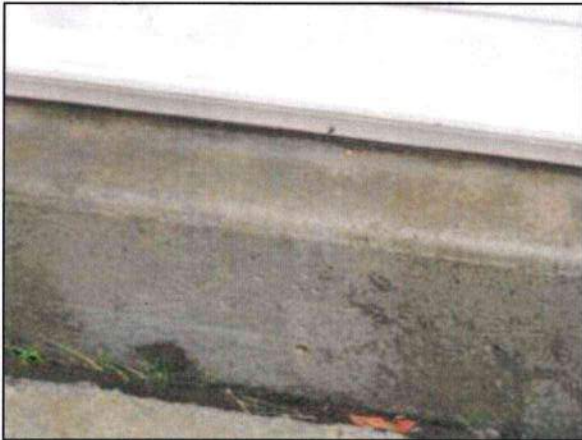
Fire Station #4 The steel addition is not properly sealed to the concrete pad.
